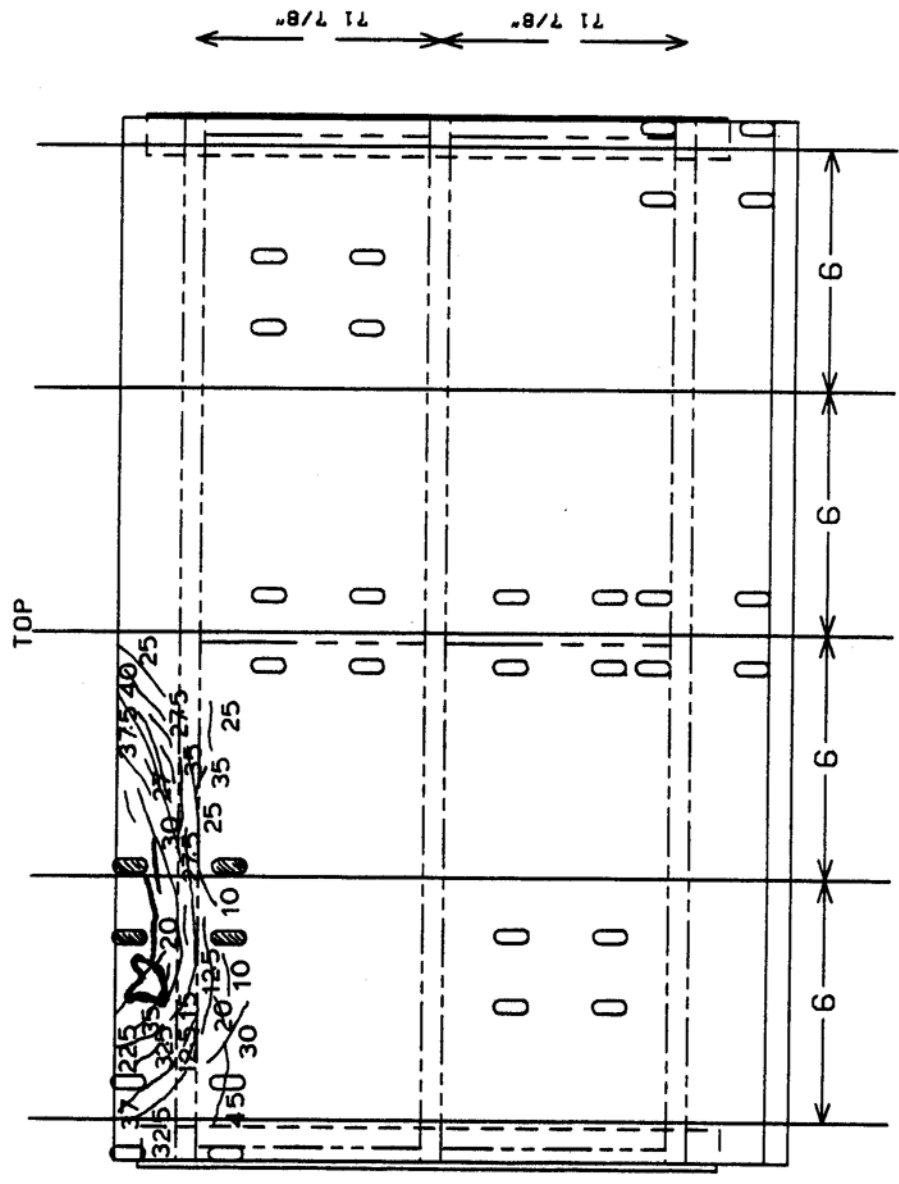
Top Cracking Pattern (Third Bridge - Test No. 8)
